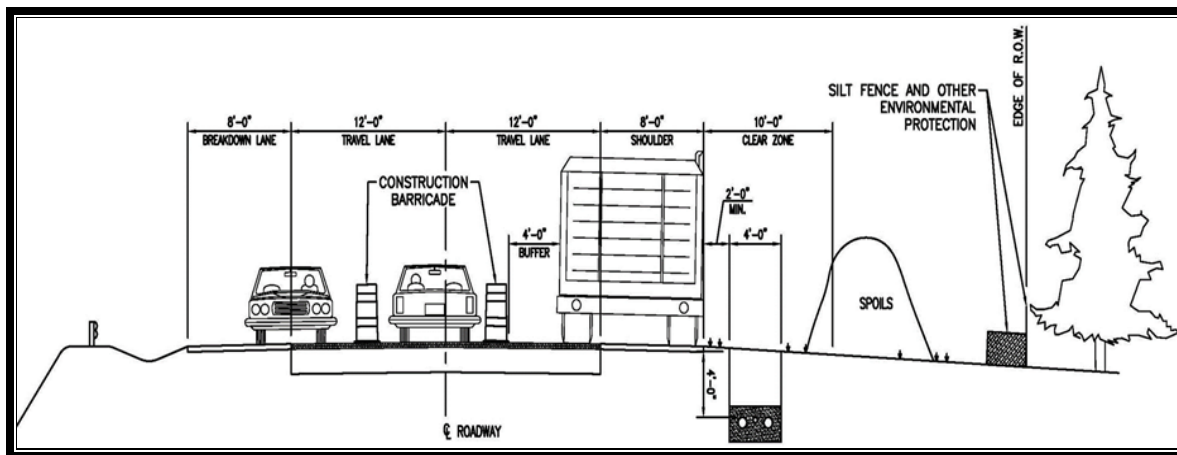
CROSS-SECTION OF UNDERGROUND SYSTEM
